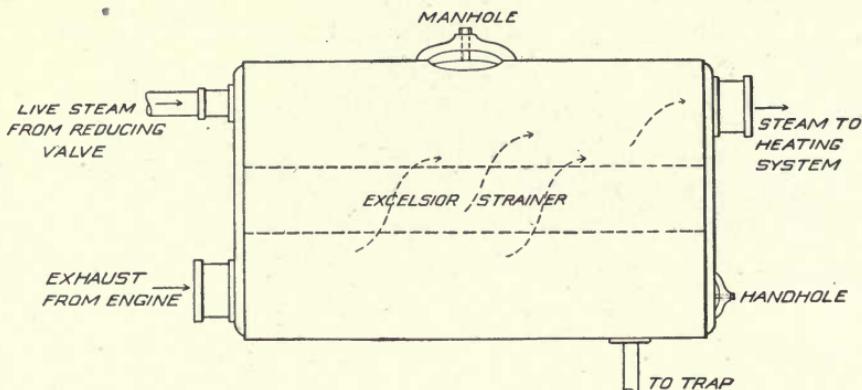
Oil Separator Consisting of a Tank in which Steam is Filtered by Passing Upward through a Layer of Excelsior.
